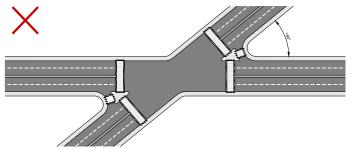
22(b): Road intersection of less than60° angle must be avoided.
